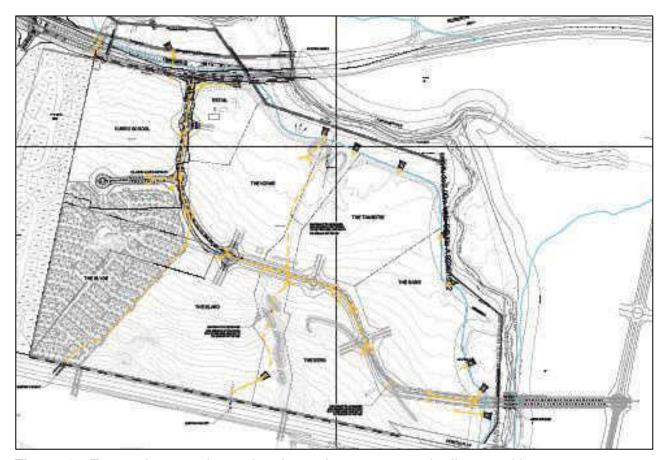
Extract from engineer drawings of storm water pipelines and layout
